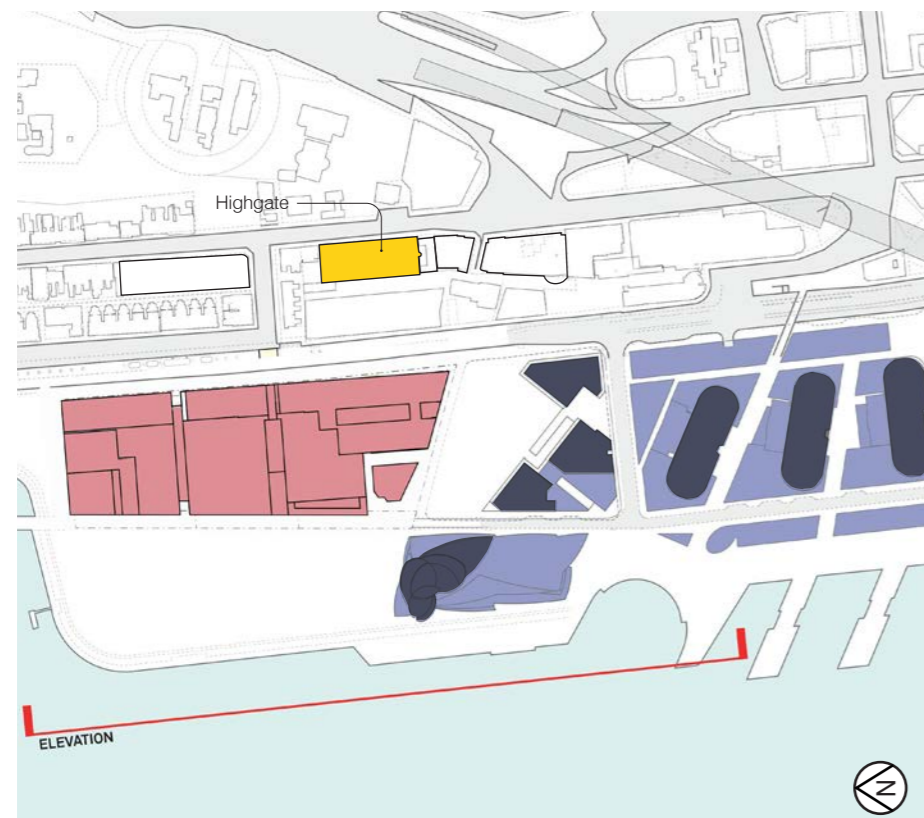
Highgate residential towers fronting Kent Street (Source: AECOM)
